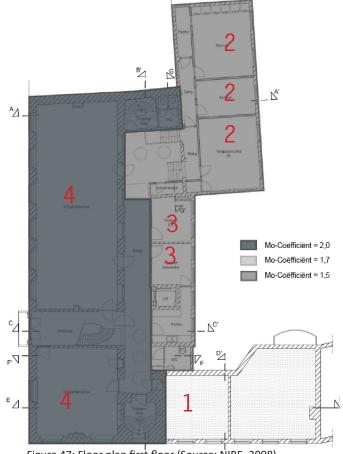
Floor plan first floor (Source: NIBE, 2008)
